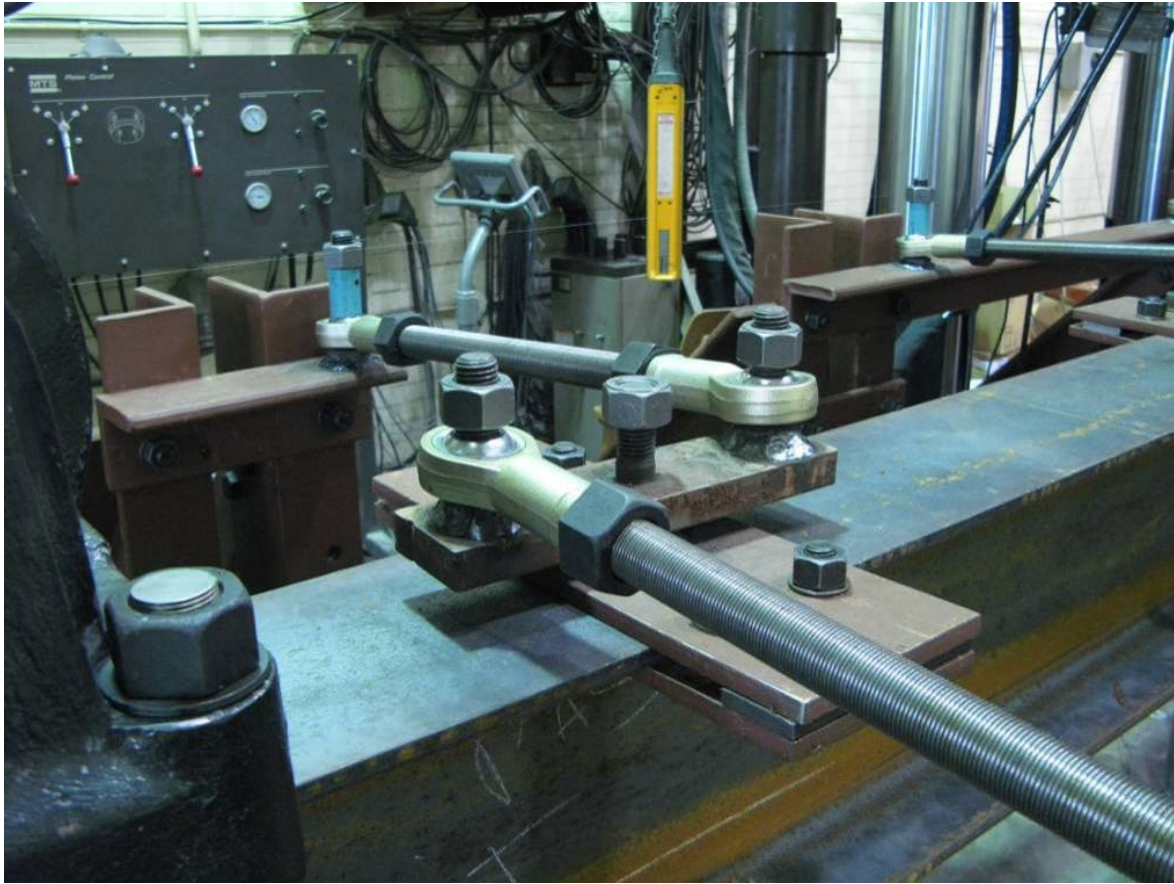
Lateral Bracing Threaded Rods and Ball and Socket Joints
